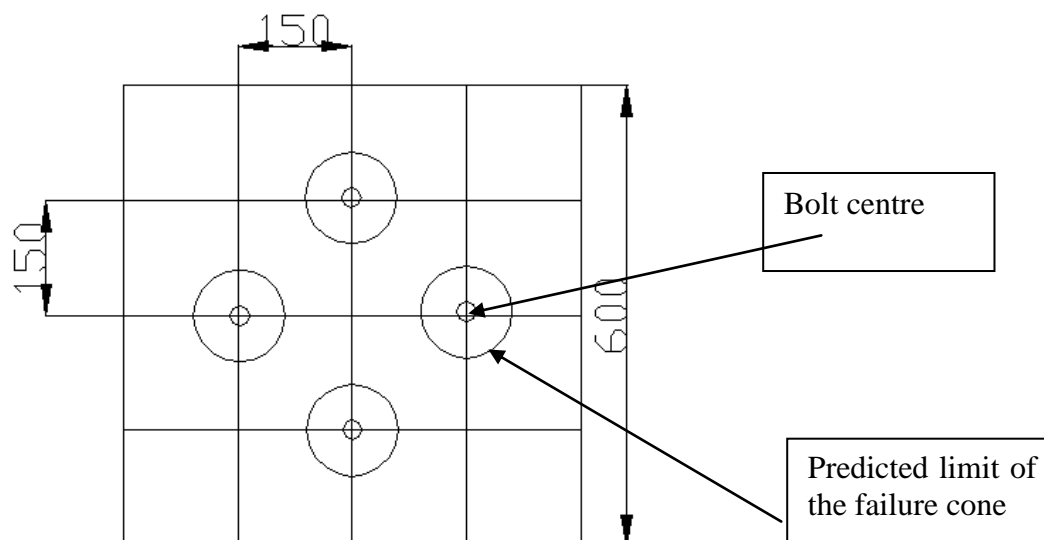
Plan diagram of anchor bolt positions and concrete slab dimensions (mm)
